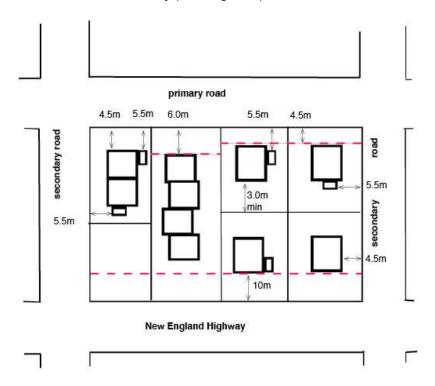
Large lot residential zone (R5)– minimum building setbacks to boundary (building lines)
